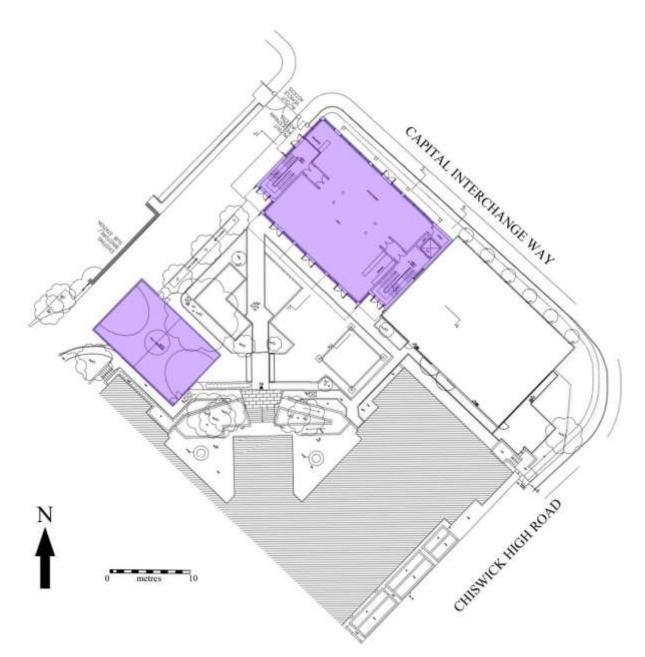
Plan of site as proposed, with blue indicating the two new structures
